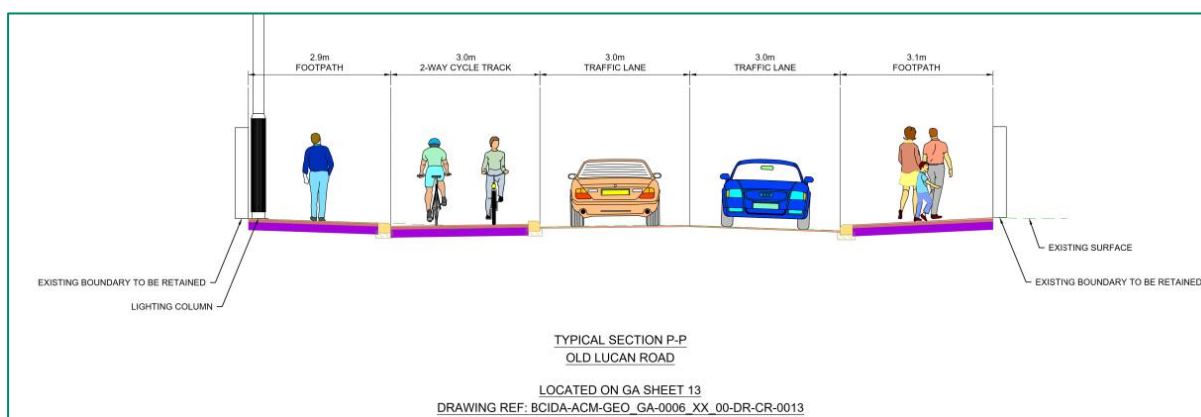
Extract of Typical Cross Section Drawings for Old Lucan Road
